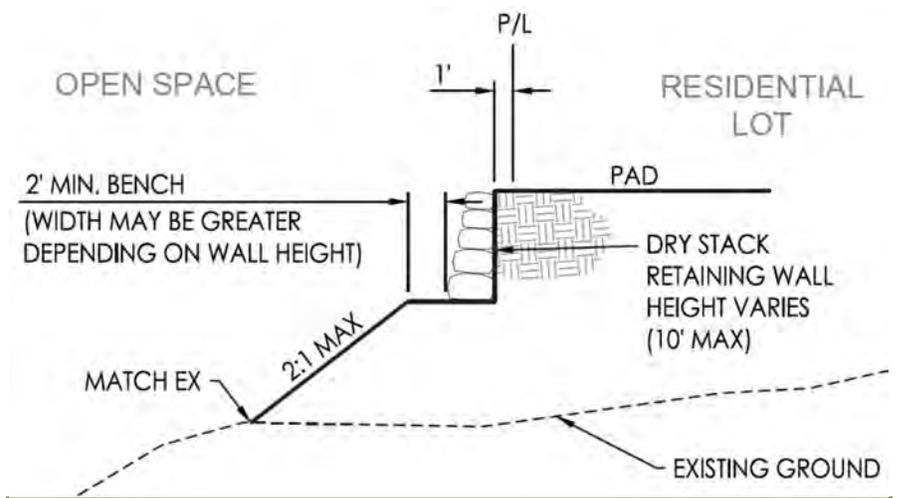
| Rear Yard Grading (Typical Design Section)
